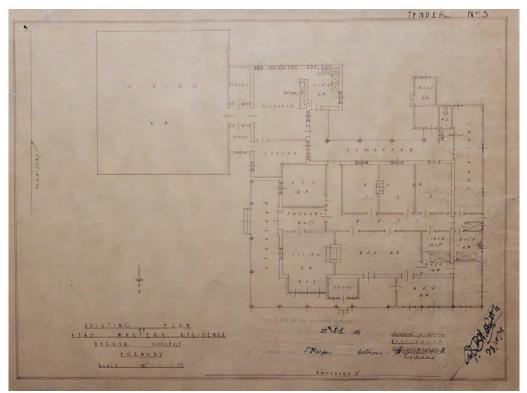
'Existing Plan of Head Masters Residence, Barker College, Hornsby', prepared by Joseland & Gilling, architects, and signed by contractor J. Harper on 25 October 1928. (Source: Barker College Archives, Plan M0004).
